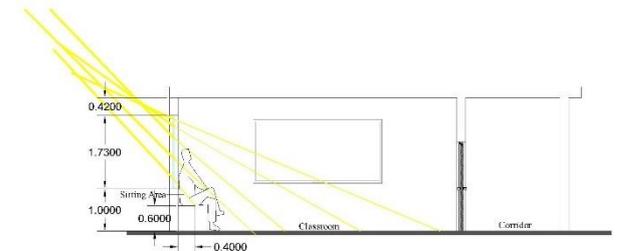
Schools Classroom Section Detail with Additional Wall Zone.
